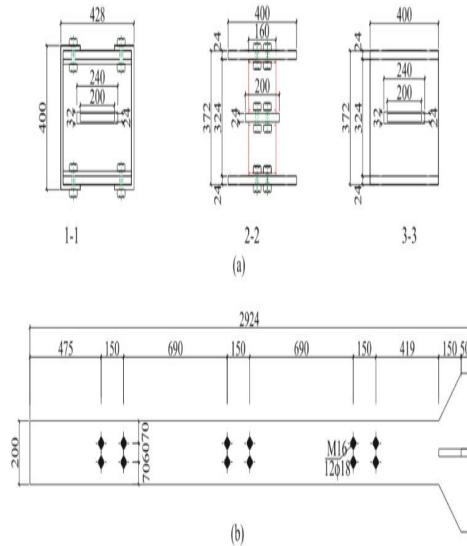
damper design: a. diaphragm and casing elements, b. piston element
